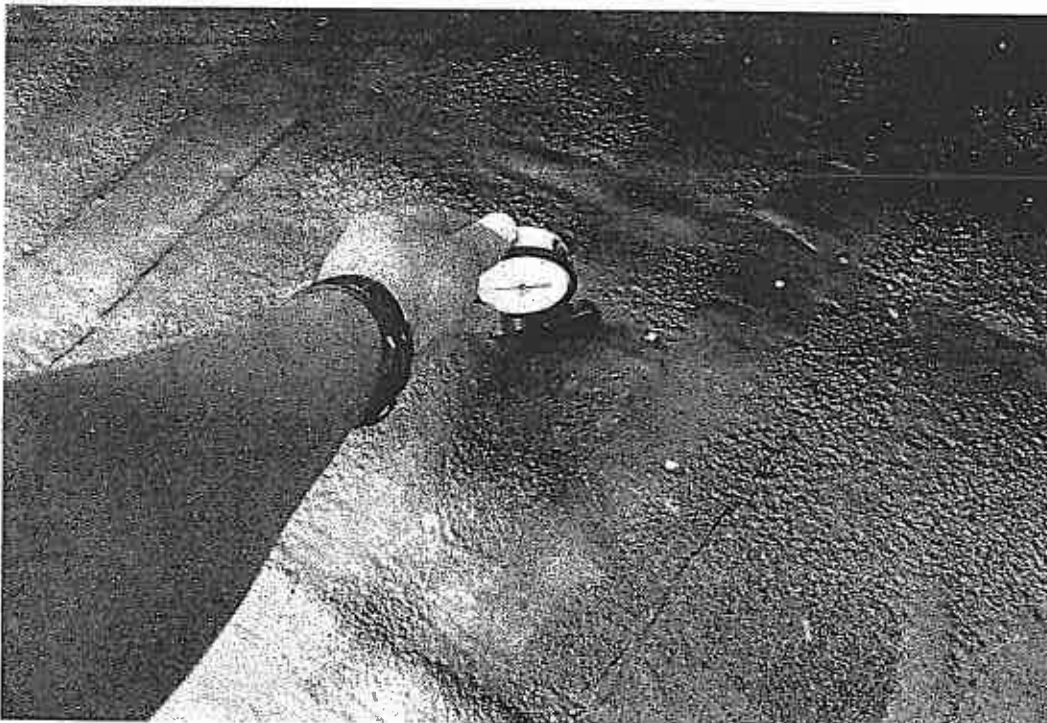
Looking in a easterly direction along the slab edge and wall, showing the peel-and-stick membrane installed.
